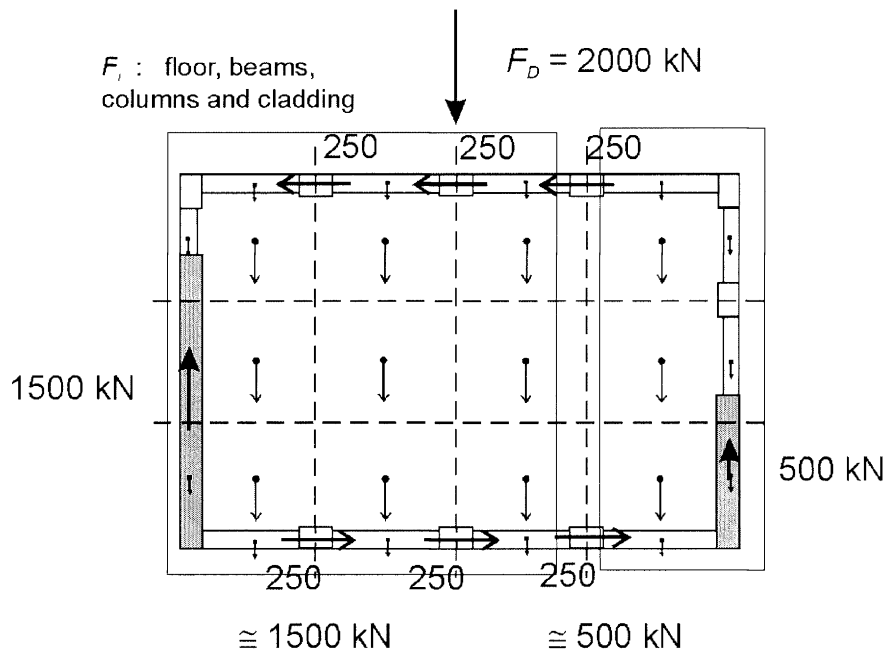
(a). Assumed inertia, wall forces and column forces on a floor.
